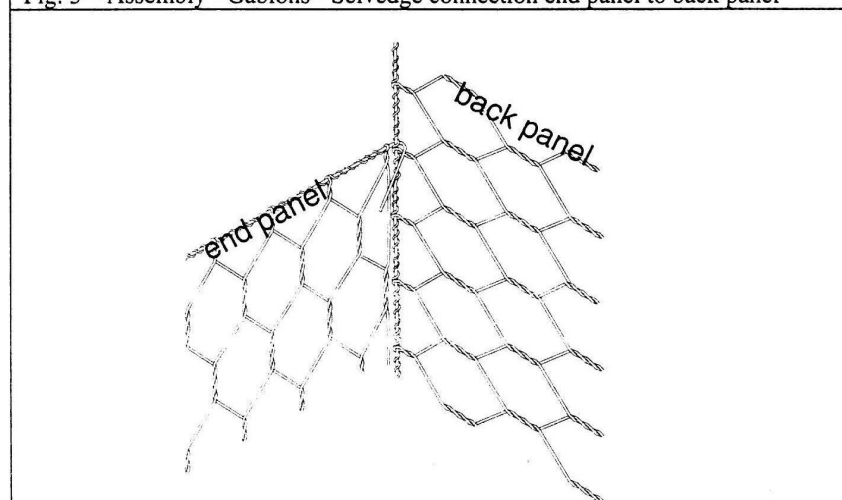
Assembly - Gabions - Selvedge connection end panel to back panel
